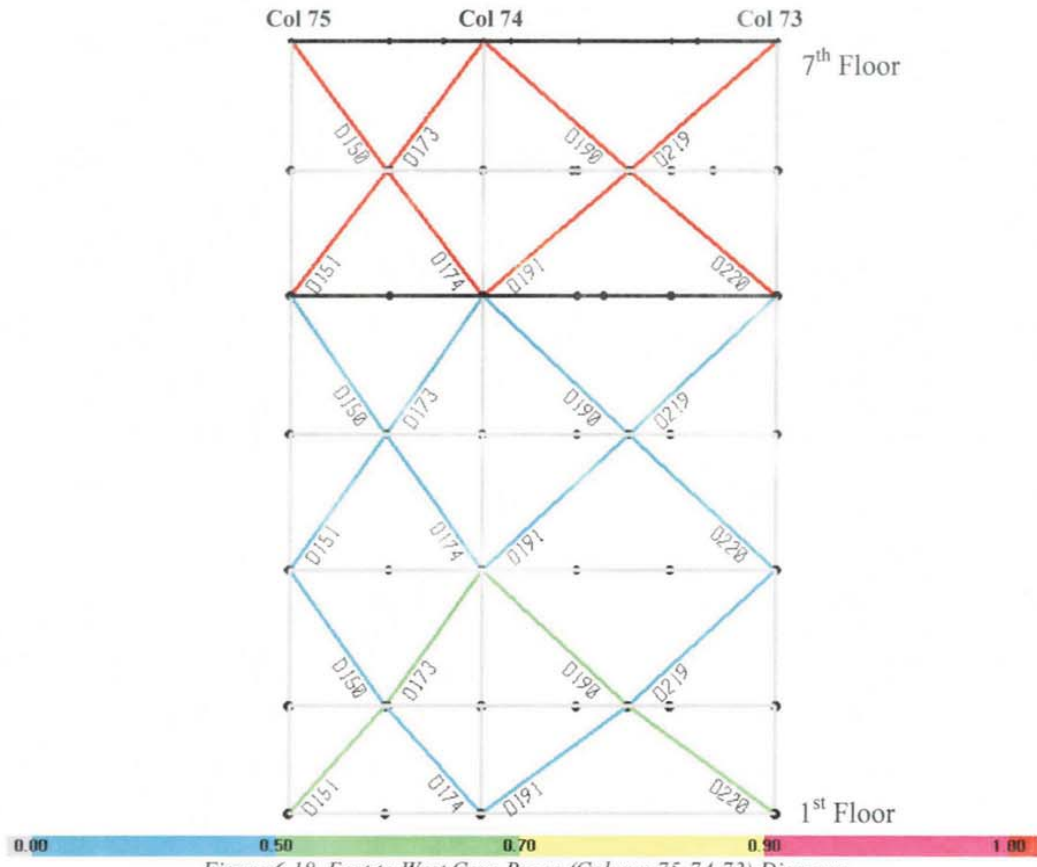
East to West Core Brace (Column 75-74-73) Diagram
